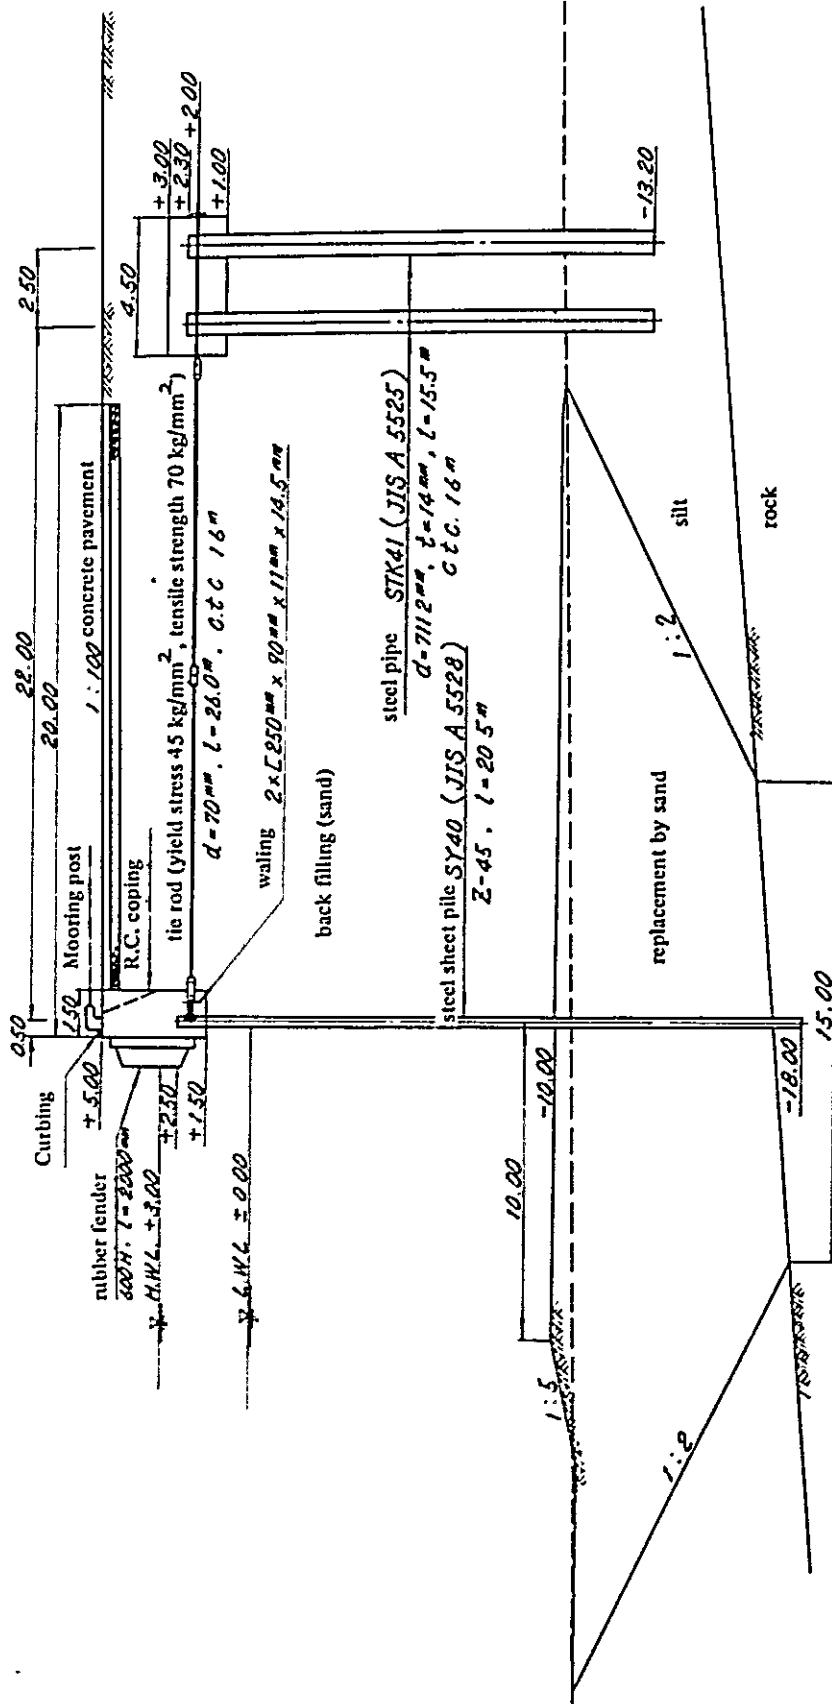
Standard Cross Section of 10m Quay Wall (Punta Morales)
